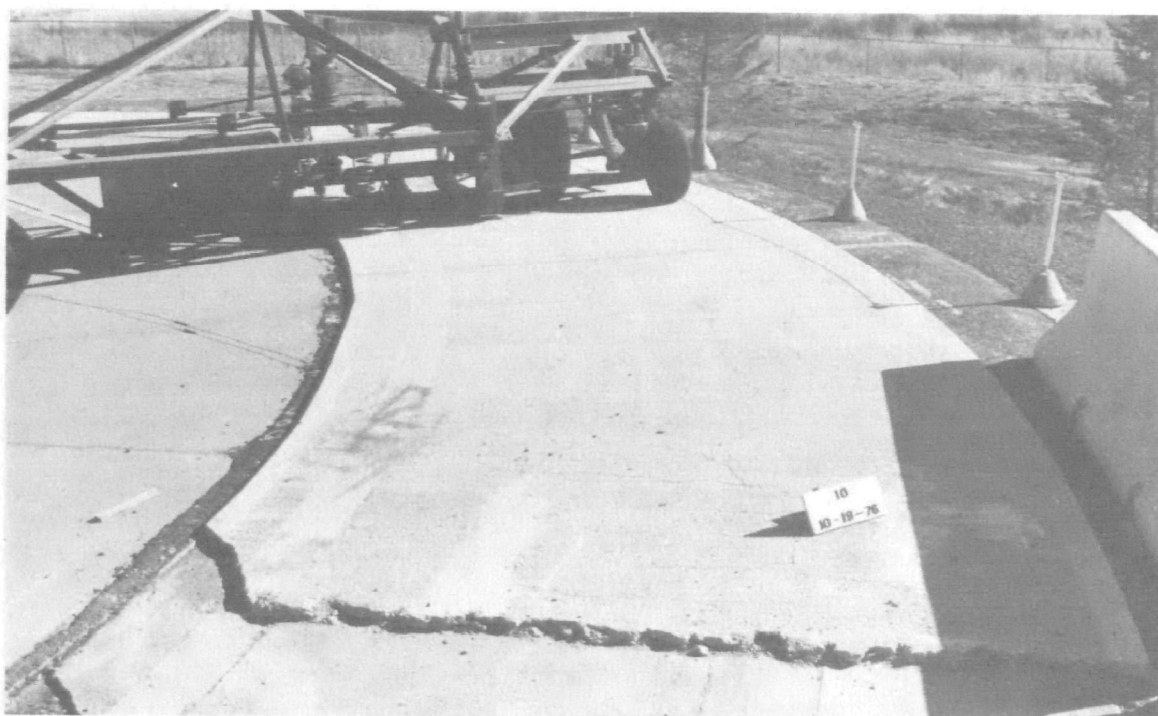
Appearance of in-place portland cement concrete pavement, Sections 7-10. 10/19/76
